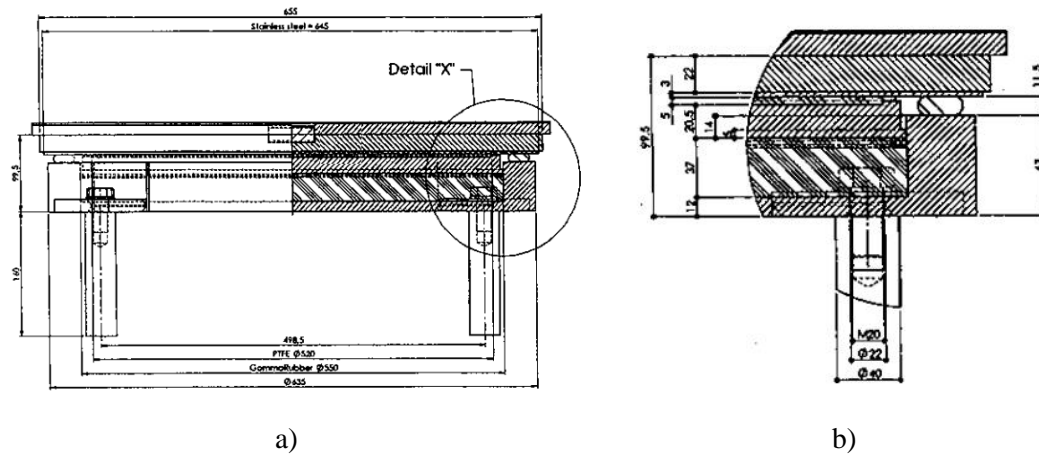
Design drawings of PNM7500/120/20 bearing: a) elevation view; b) detailed view
